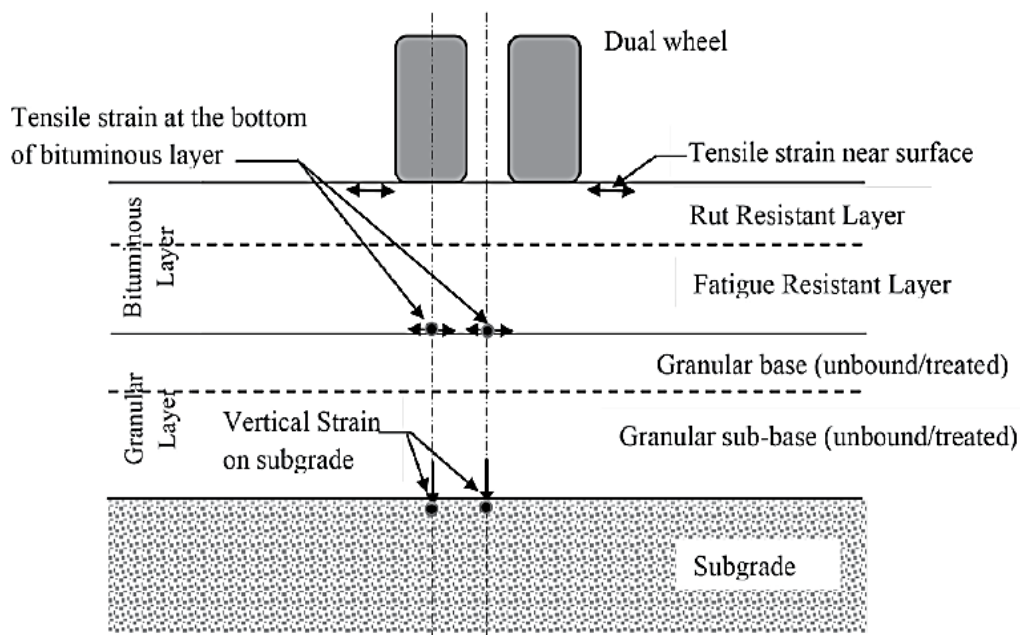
Pavement sections with bituminous, GB and GSB showing the locations of critical strains [1]
